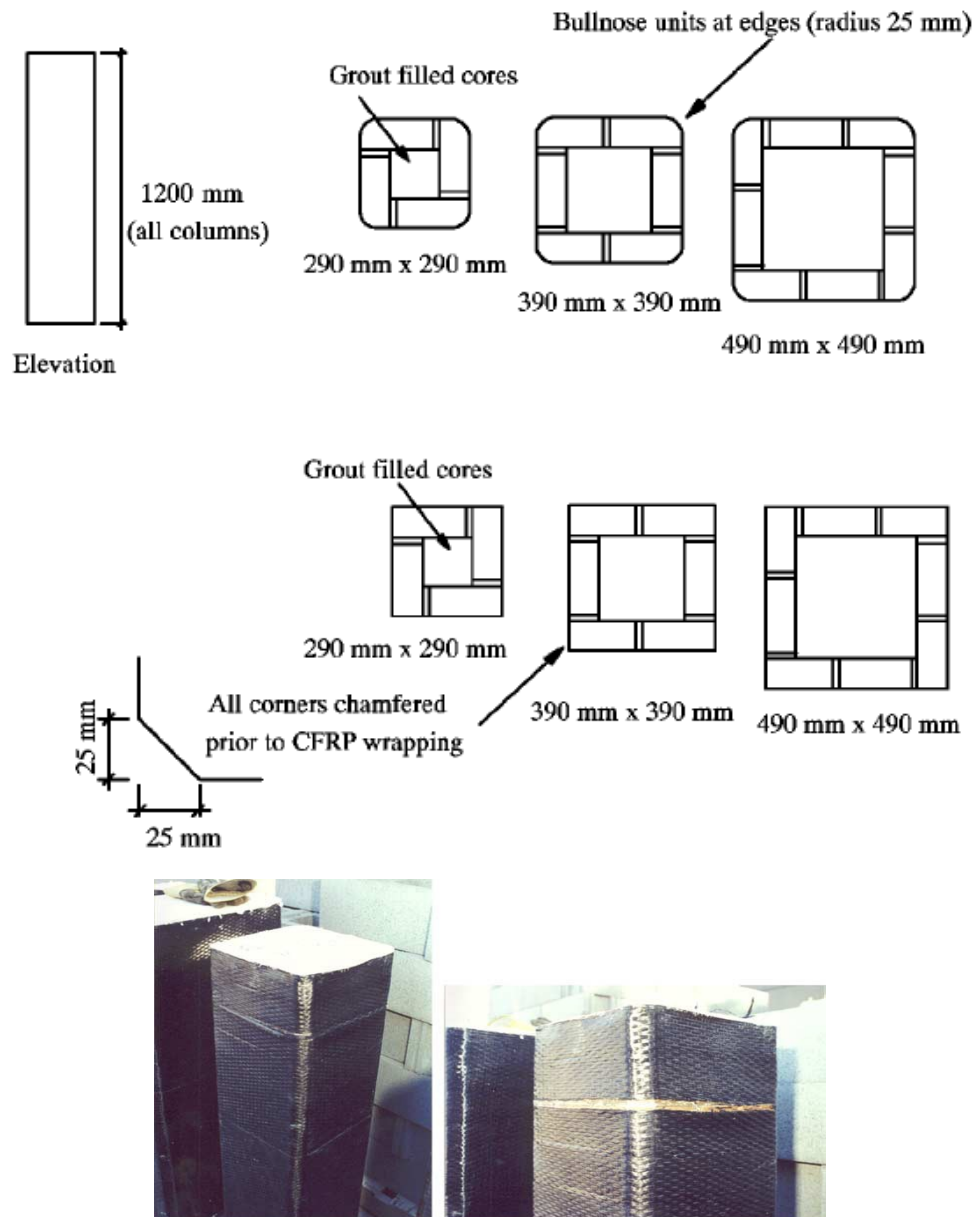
Details of block masonry columns tested by Khalaf et al. (1993)
